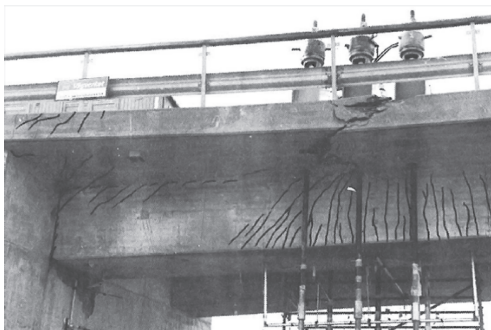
The Stora Höga Bridge 2 after shear failure in the supporting wall and deck slab (Kjellgren & Bergström 1990)
